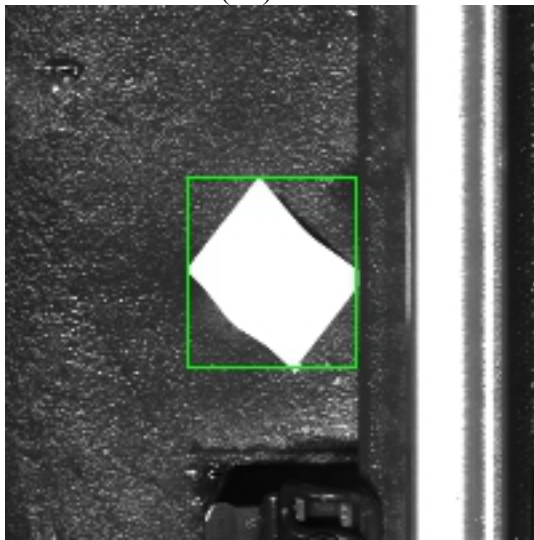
Inspected defects in the elevated section after rain. Up direction right rail (IV).
